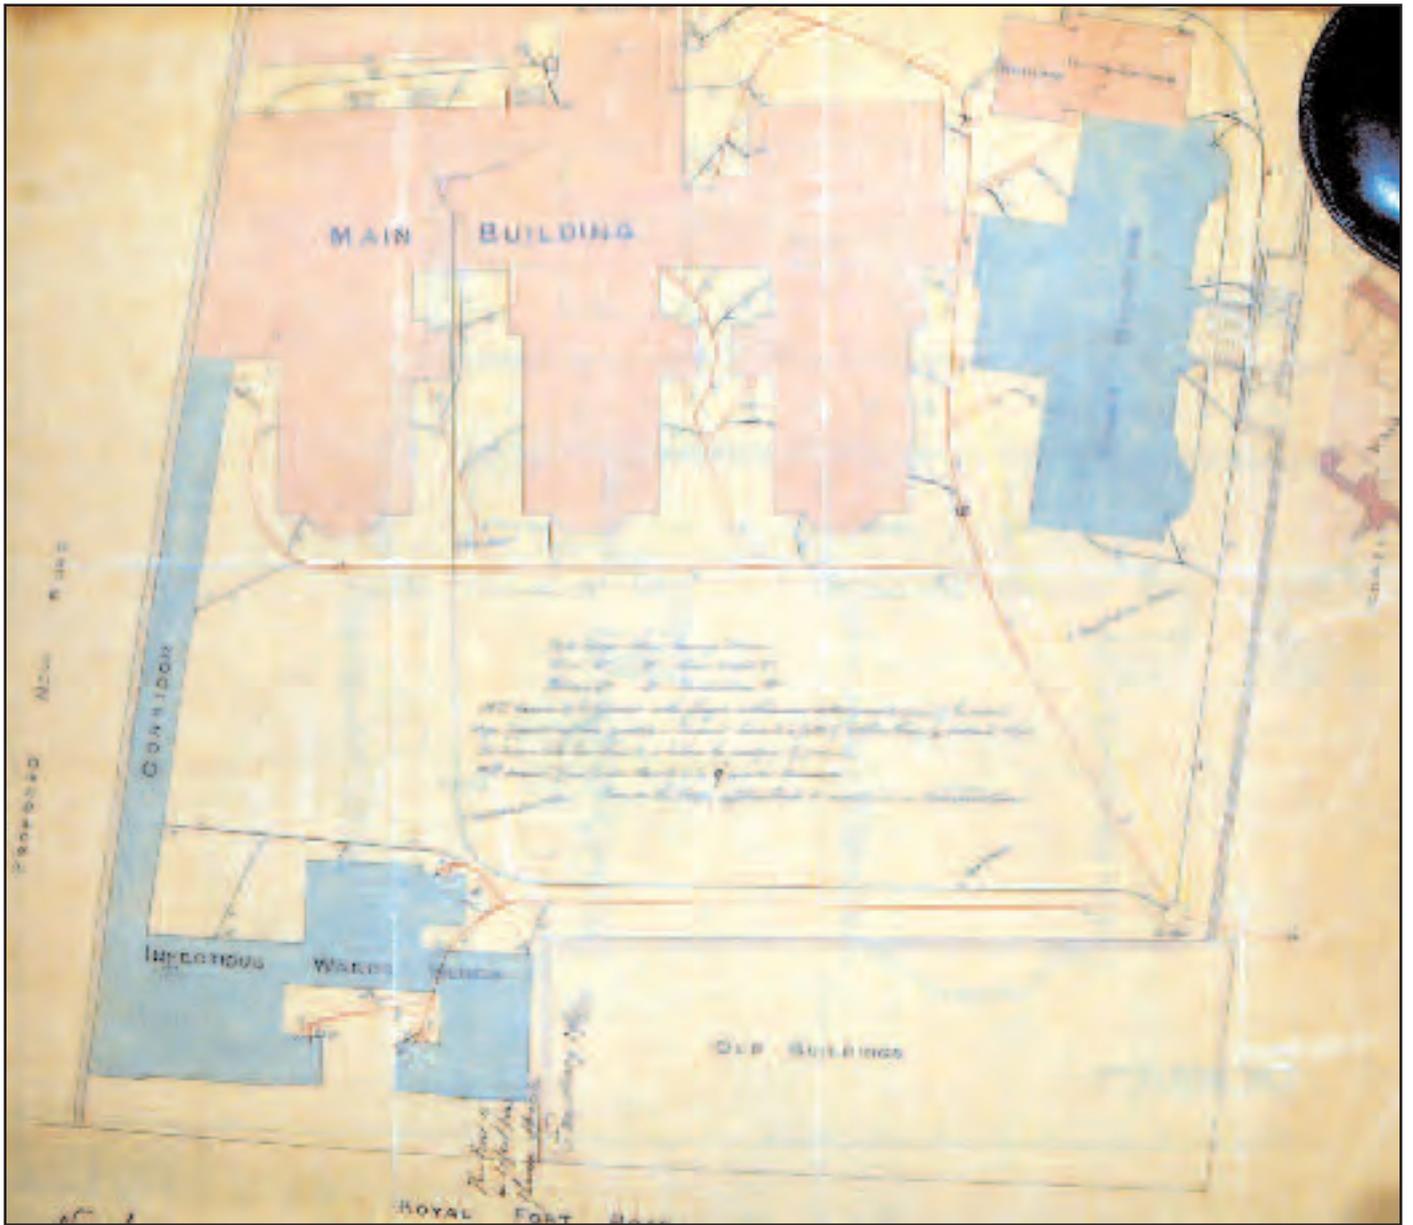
Children's Hospital, 1882 - block plan, including proposed new road
